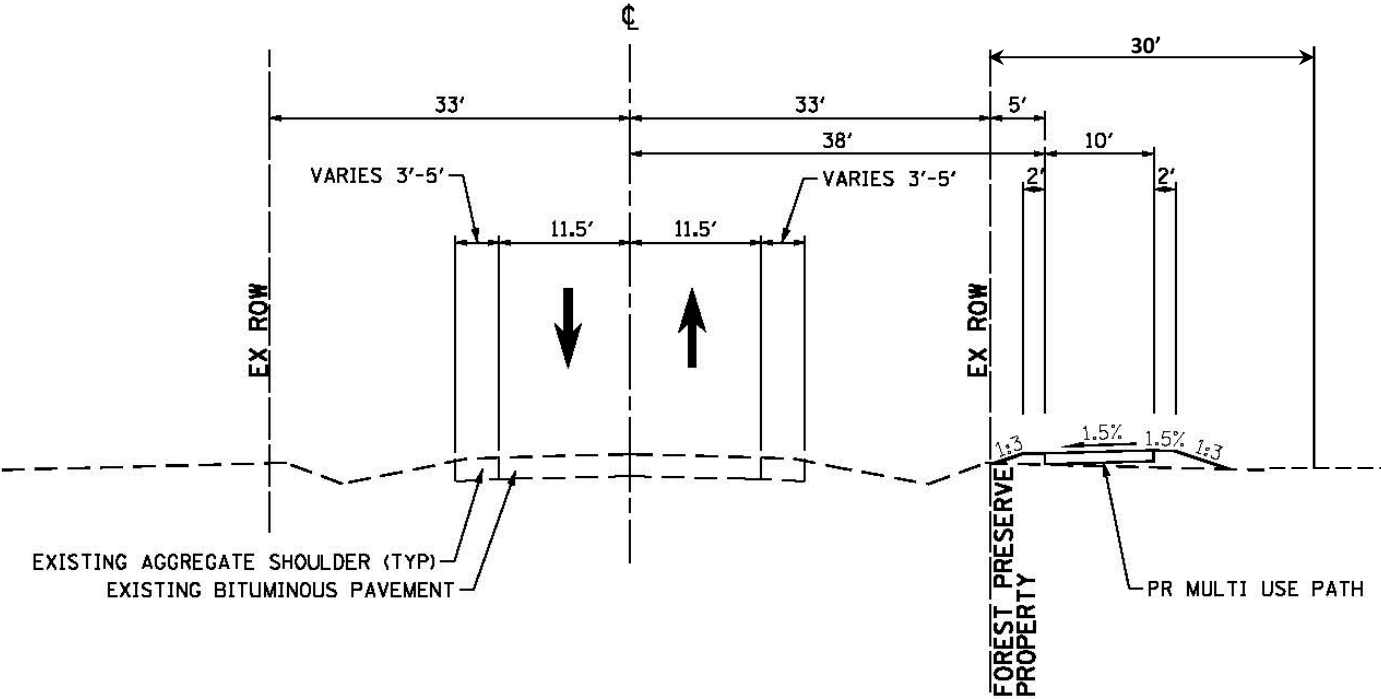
, Proposed Typical Section – Granart Road Multi-use Path
